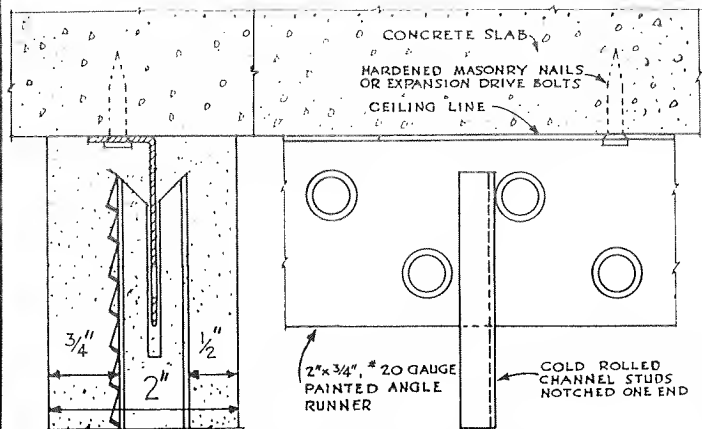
A. ANGLE CEILING RUNNER—2-inch by 3/4-inch angle runners are attached to ceiling with masonry nails or equivalent anchors. Channel studs are notched and slotted at one end. Studs are placed by slipping slotted end upward onto downstanding leg of angle runner and dropping down into crimped floor runner as in Fig. 113-B at right. Burrs on holes prevent tipping of channels.
